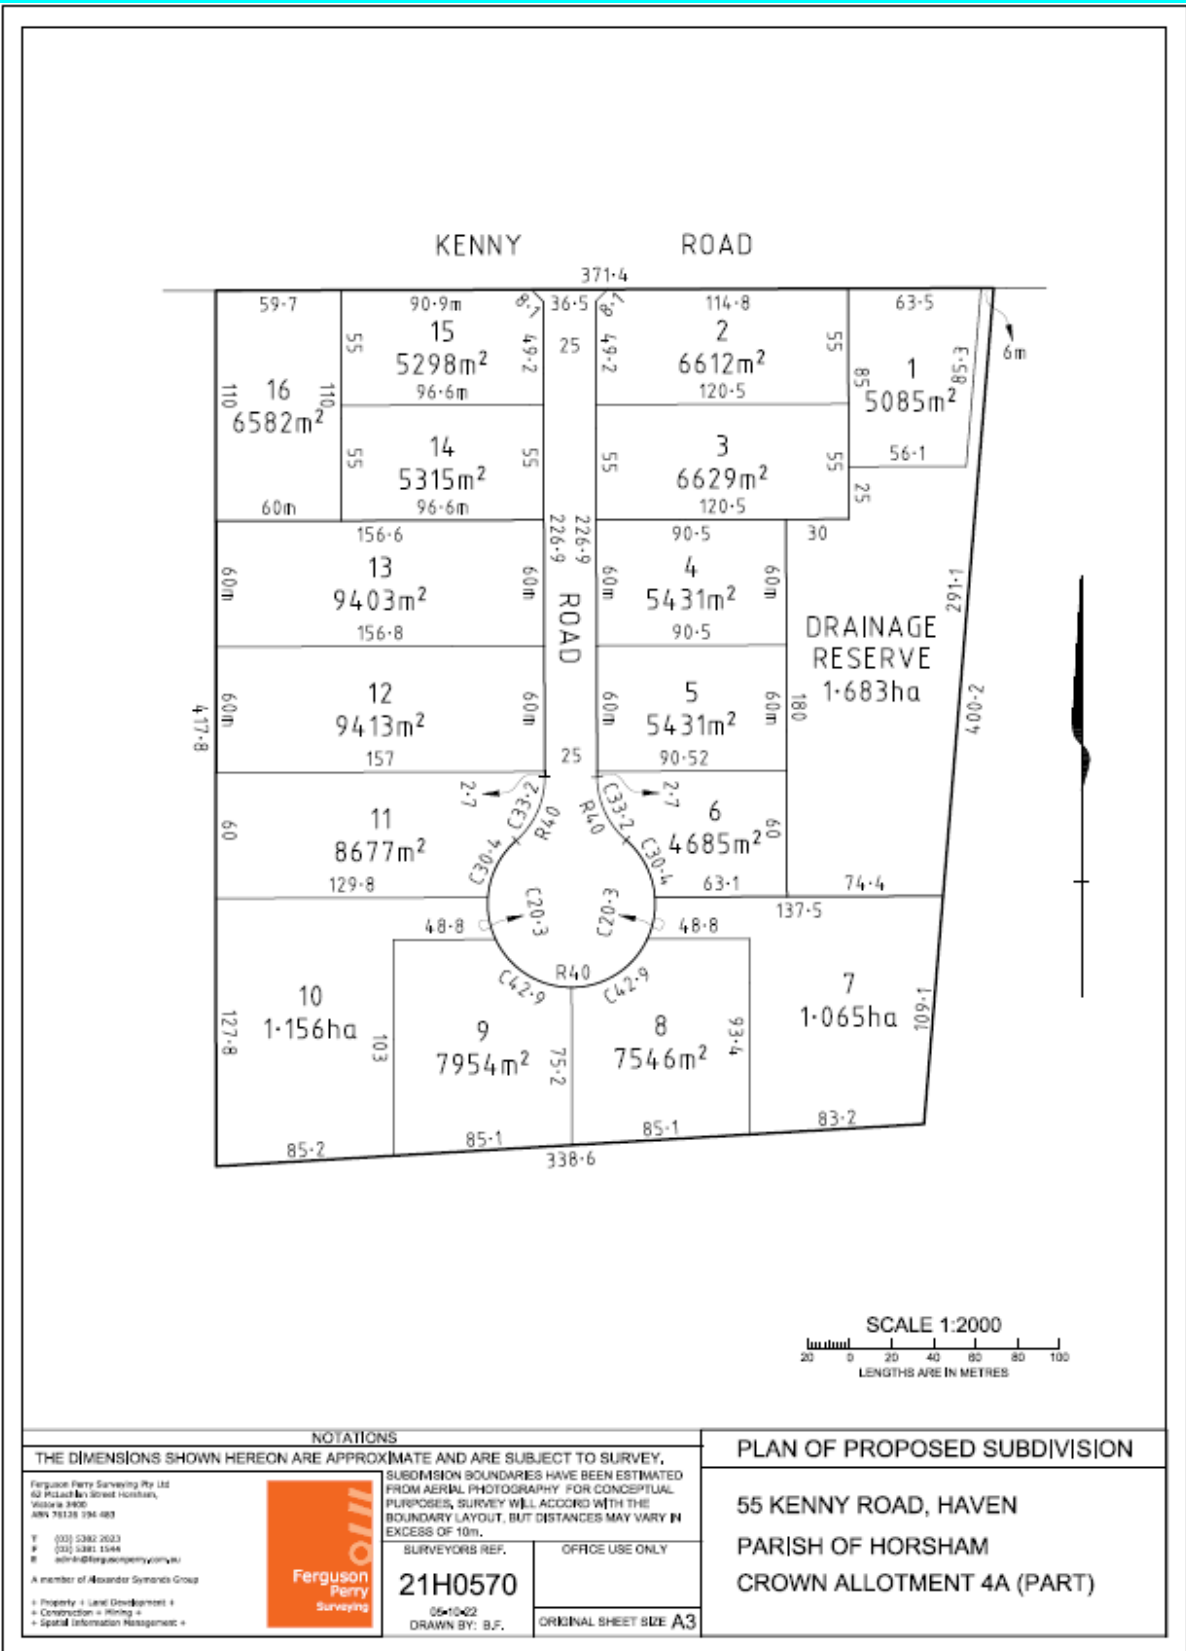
Endorsed Plans under condition 1 of the Kenny Road Permit.
